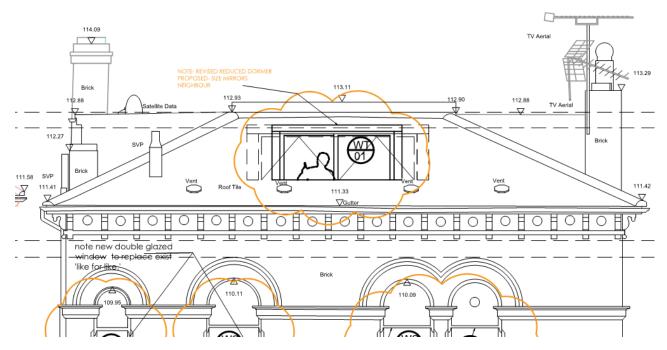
(above): Revised proposed dormer (with previously proposed in dashed lines)
